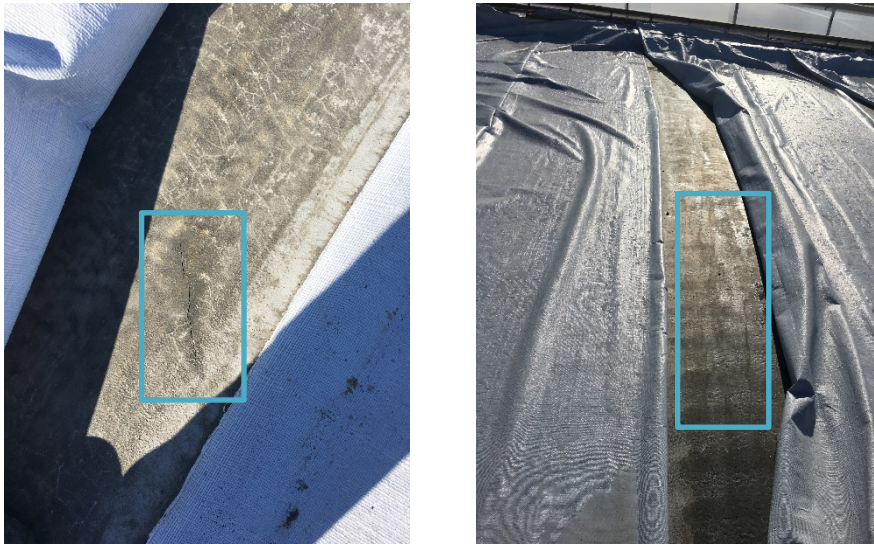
Shoup Bridge – 17 months Bridge Deck Cracking Survey, random fine crazing cracks parallel to span length (All photos provided by FHWA Federal Lands)
